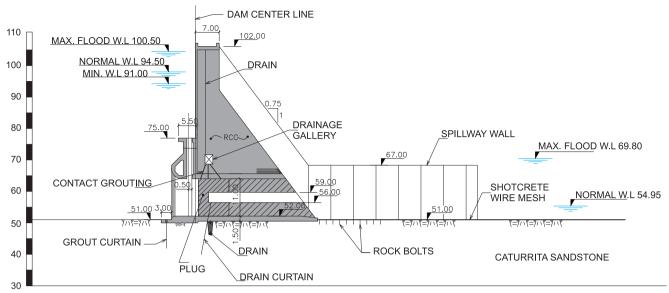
Diversion Sluiceways in the Right Bank Dam
